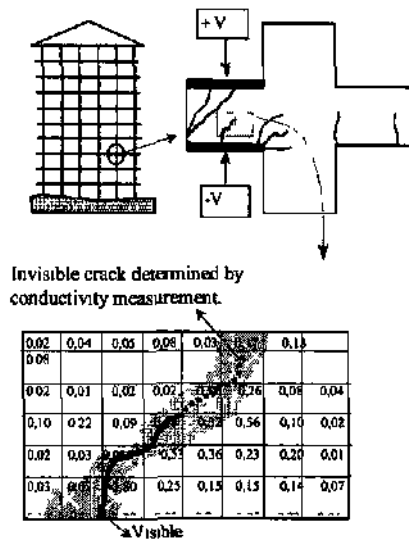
Monitoring of the cracks on concrete blocks.
